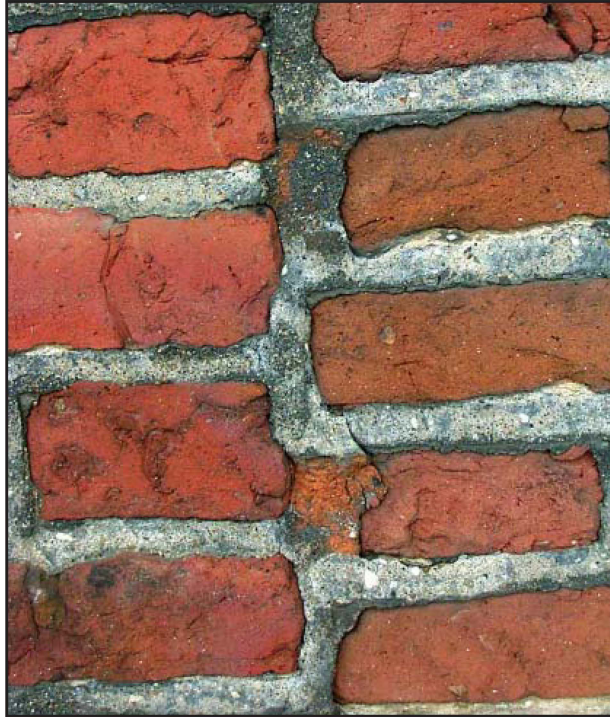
East elevation, second floor, external view, area to north of window, illustrating darkened mortar used to define edges of bricks and red mortar used to bridge structural gaps
